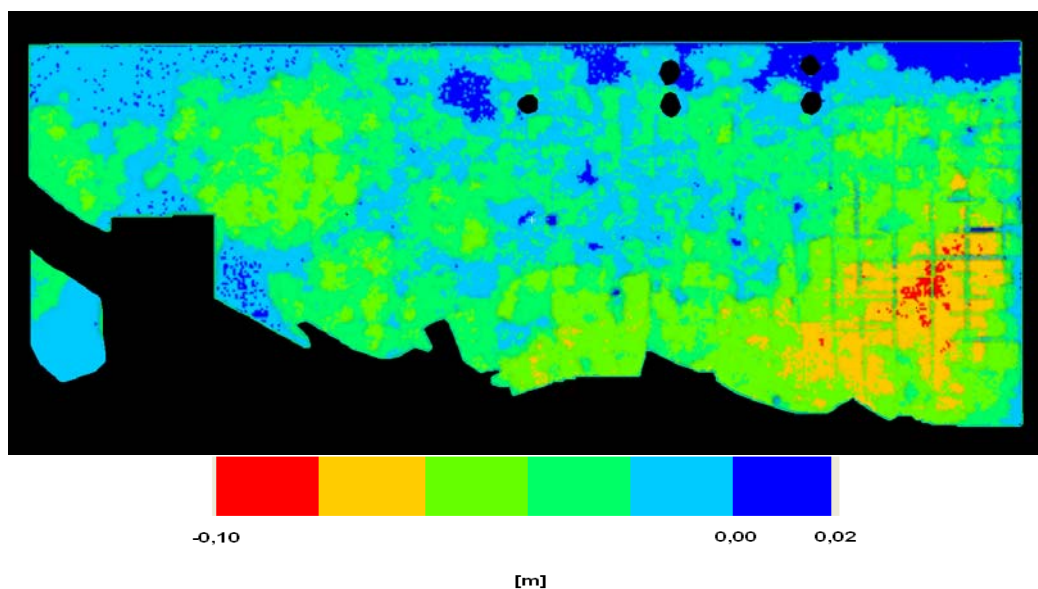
Difference model of the monolithic concrete wall (opposite the window)
